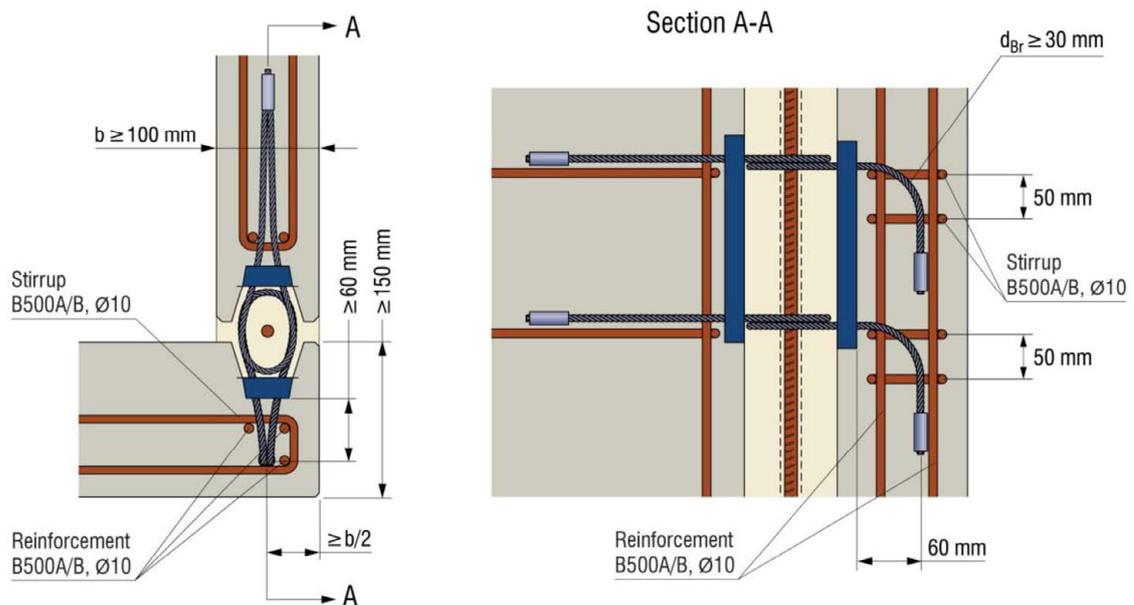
Wall – Wall – Corner connection - detail with bended wire loops
